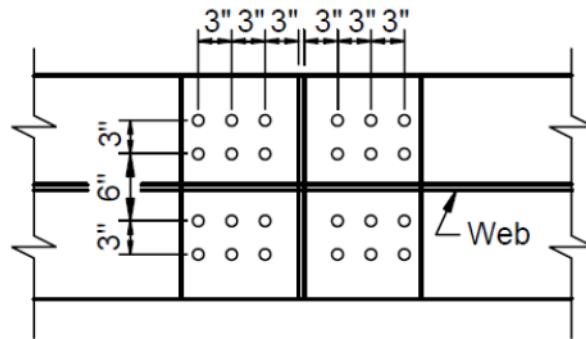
Typical Bolt Pattern - Top Flange Field Splice (Steel Bridge Design Handbook)
